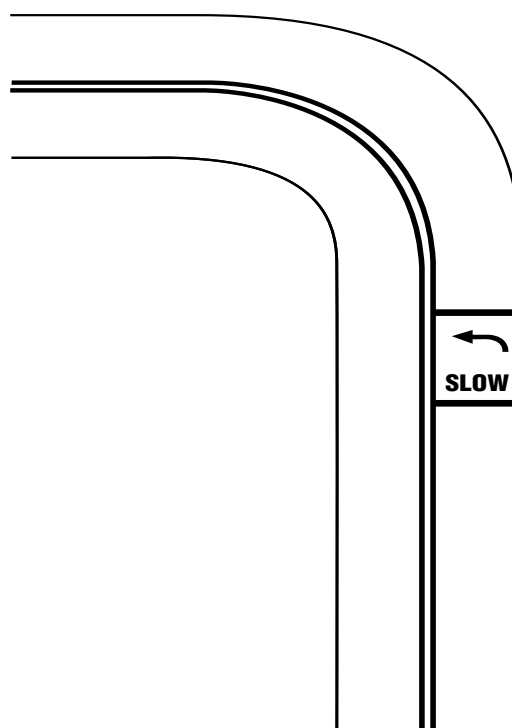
On-pavement SLOW (after Retting and Farmer 1998)
